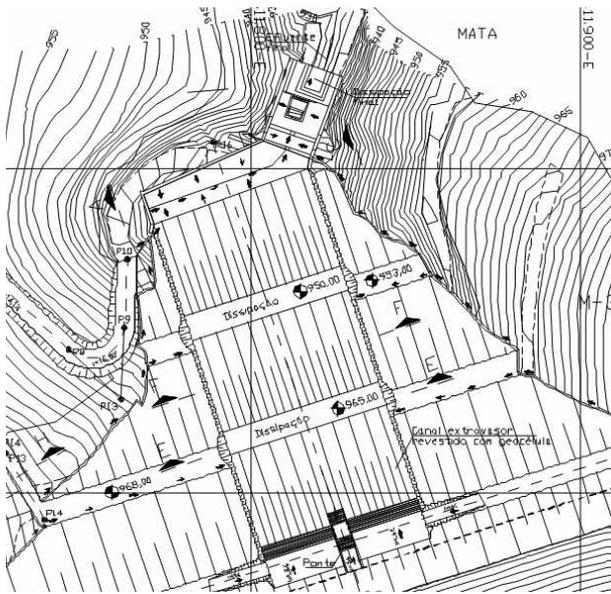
Plan view of Capão da Serra Dam Spillway Project.
